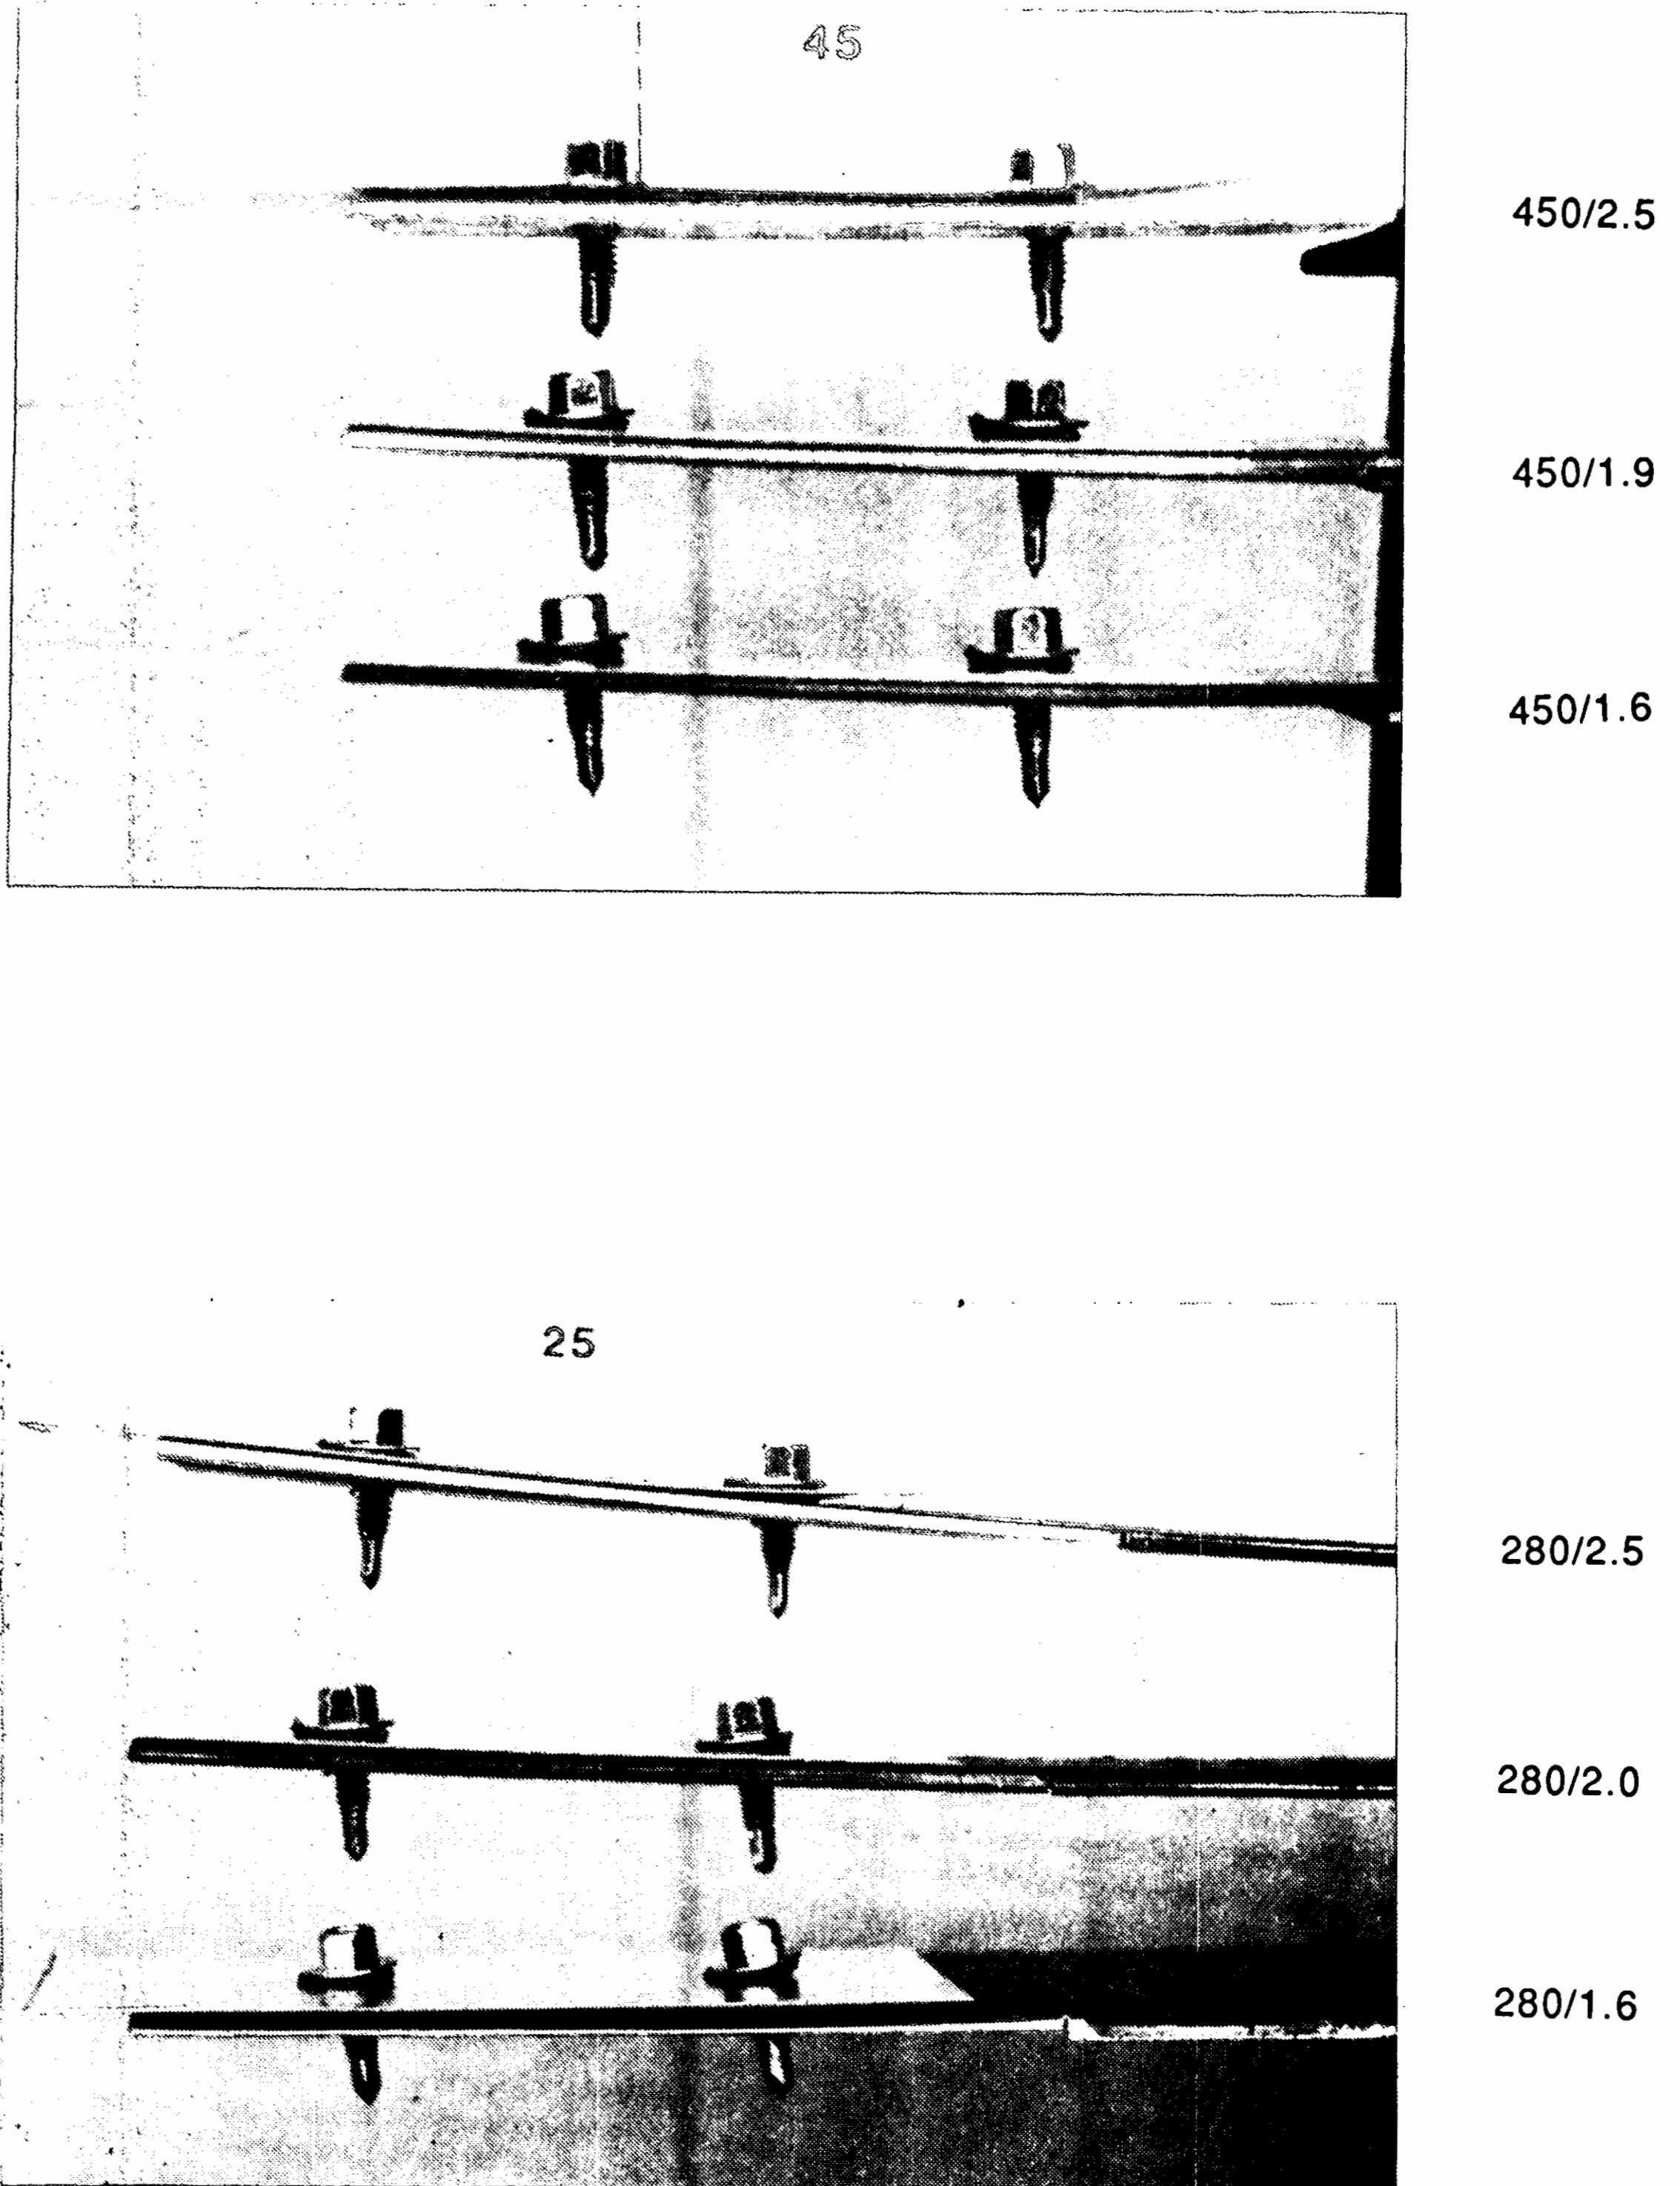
Sheet (0.55 mm)-to-purlin connections (12g neo) after shear tests.
